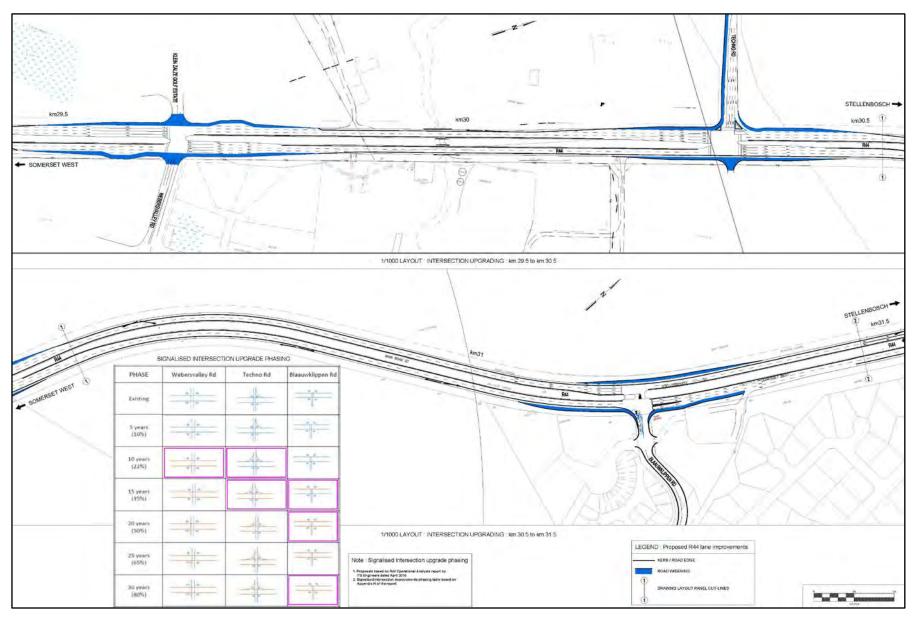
Proposed improvements to signalised intersections: Webervallei Road; Techno Road and Blaauwklippen Road (K&T, 2015)
